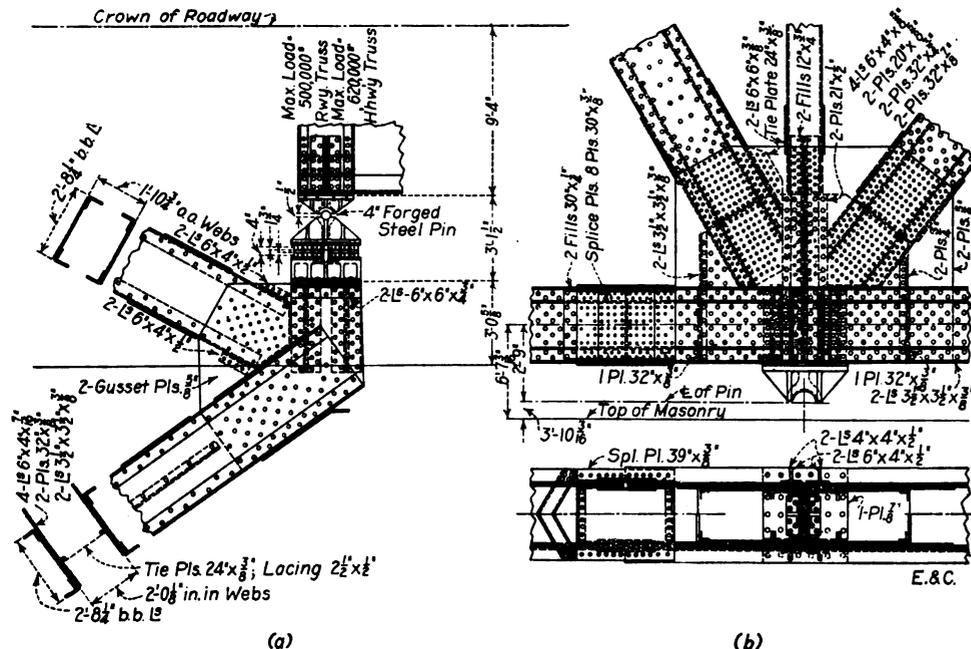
(a) Detail of Connection Between East Cantilever Arm of North Truss Span and Approach Girder; (b) Detail of Lower Chord Joint at Pier No. 2 of North Truss of East Kansas Ave. Bridge.
